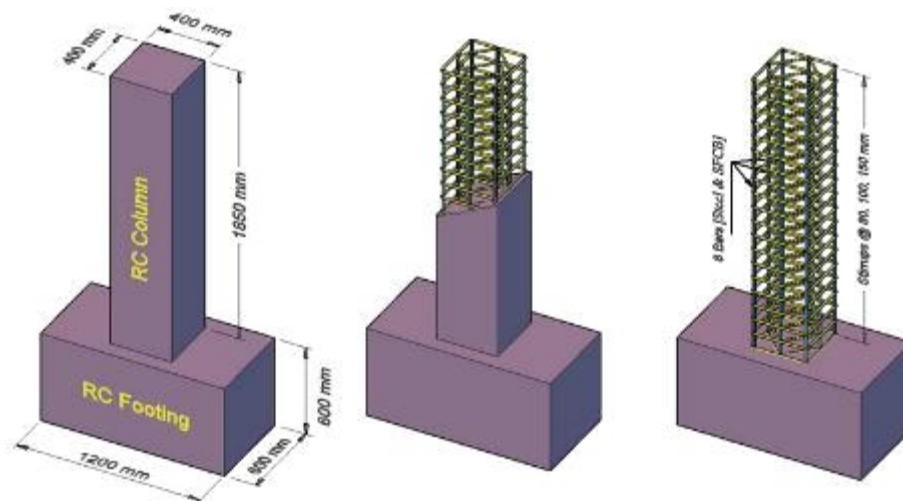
Concrete dimensions and reinforcement details (all dimensions are in mm)
